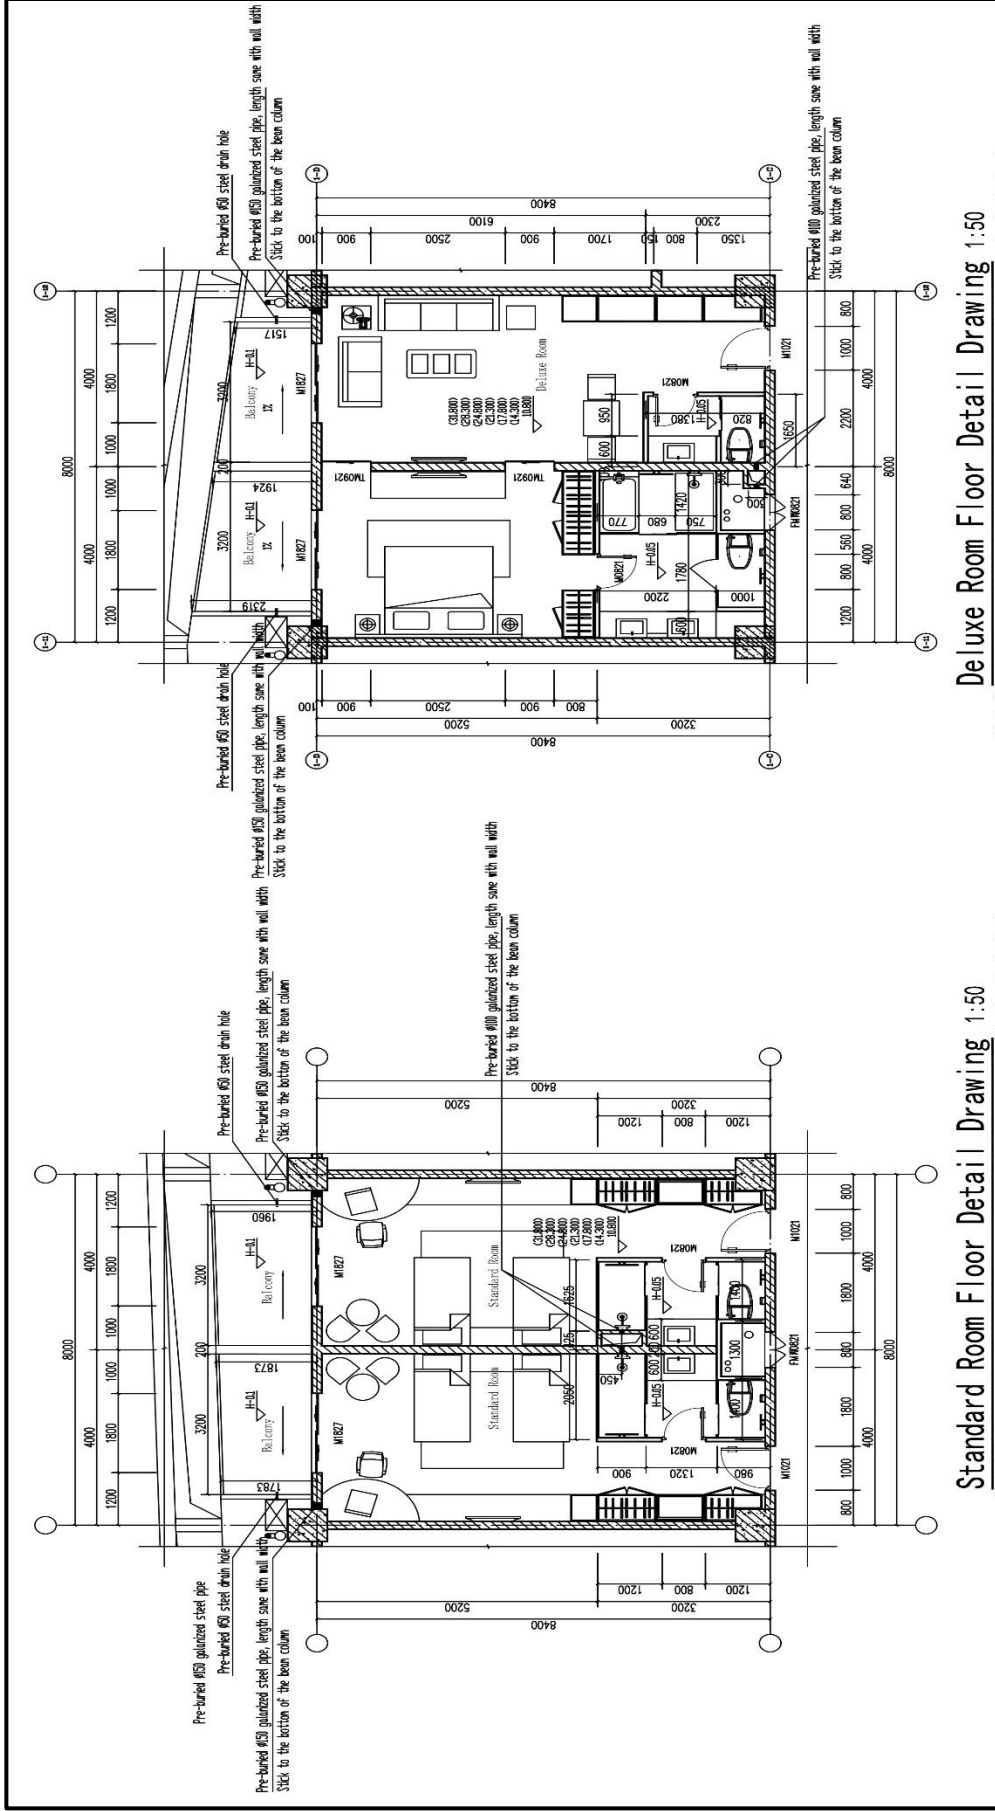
Floor Detail Drawing for Standard Room and Deluxe Room
